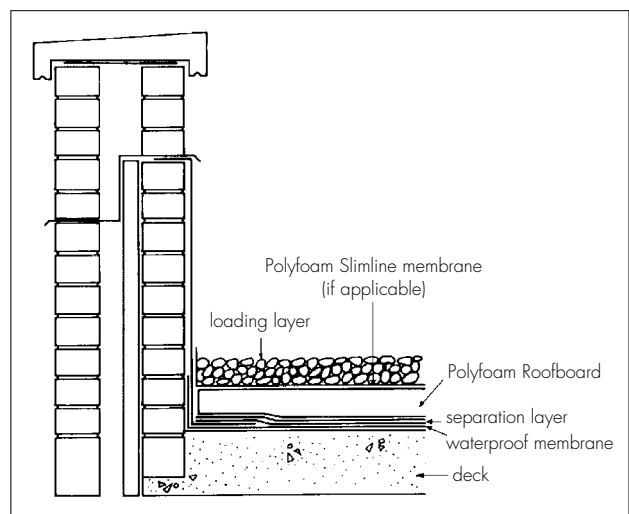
Parapet roof deck detail – bituminous waterproof membrane
